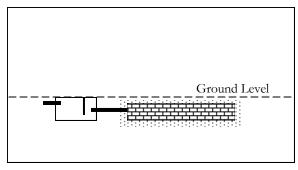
B. (Side View) Septic Tank and Brick-Trench System. Slotted openings in walls and long bottom of each side allow for appropriate lateral absorption. Brick-Trench systems require a stable gravel base and footing for construction to ensure structural integrity. Depending on materials and soil conditions waterproofing of concrete materials may be necessary to protect mortar and joints.
